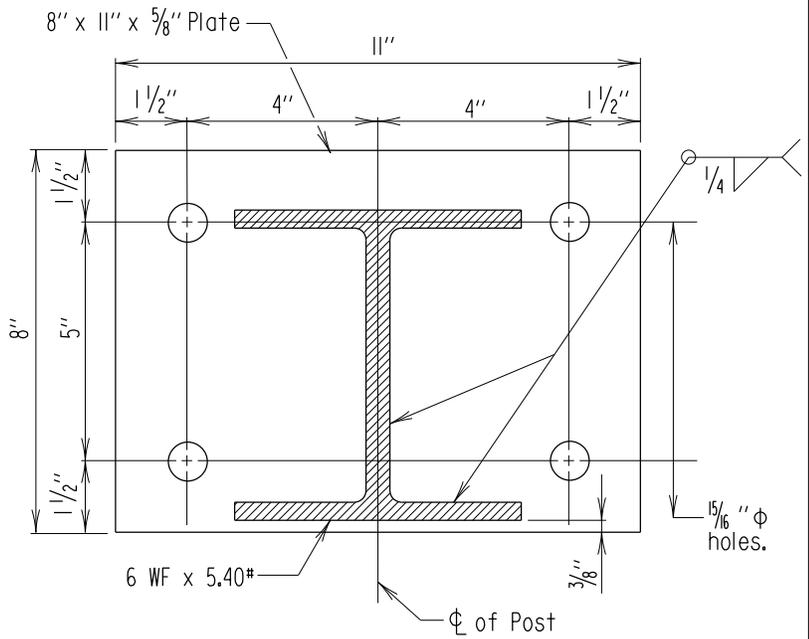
DETAIL NO. SUP-FR(RR)-101 SHEET 2 OF 4
